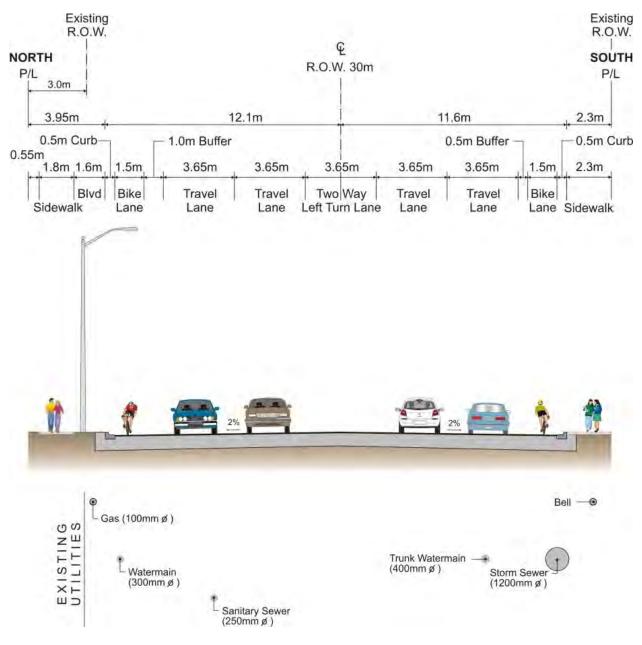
TYPICAL CROSS-SECTION COUNTY ROAD 42 COUNTY ROAD 43 (BANWELL ROAD) TO SHIFF DRIVE
